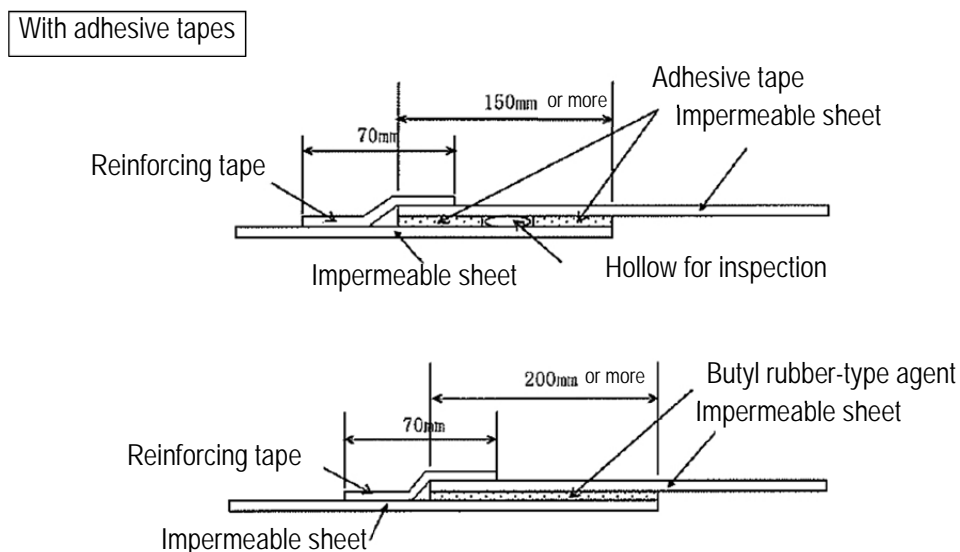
Welding of Impermeable Sheets
